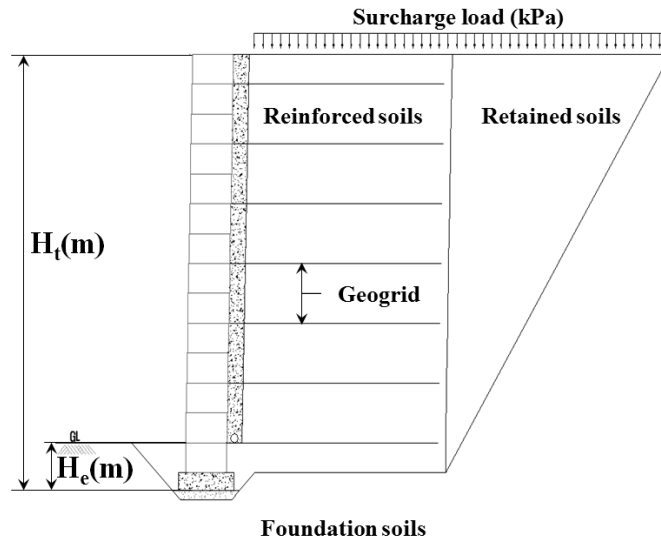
Generic cross section for stability evaluation of reinforced earth wall
